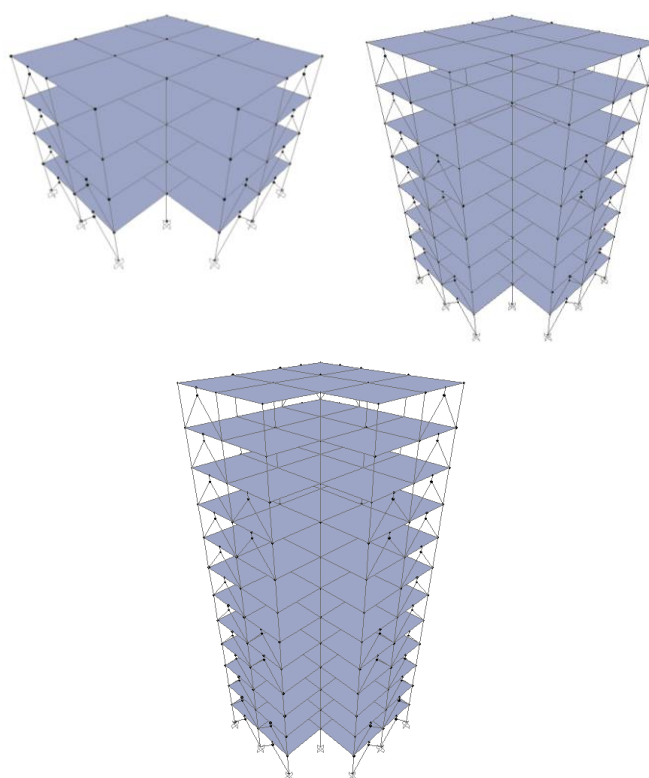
Elevation view of the second bracing configuration of V-EBF with a single vertical link in the four-, eight-, and twelve-story buildings.
